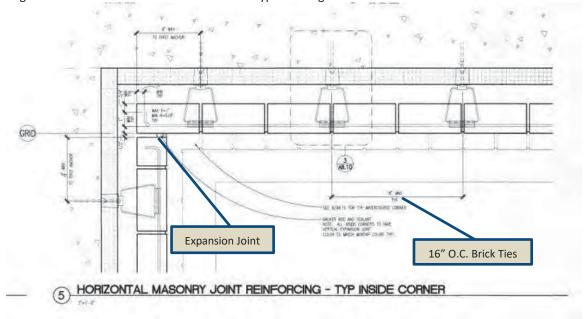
Details A-8.10/5 excerpted from the Project Record Drawings showing a typical inside corner with a backer rod and sealant joint at the vertical expansion joint. It also shows the brick ties were to be spaced at 16-inches O.C.
